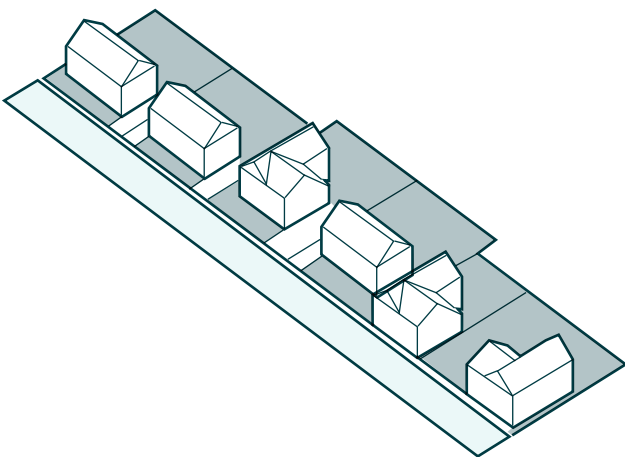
A potential site for infill. The future infill property should complement the street scene.
